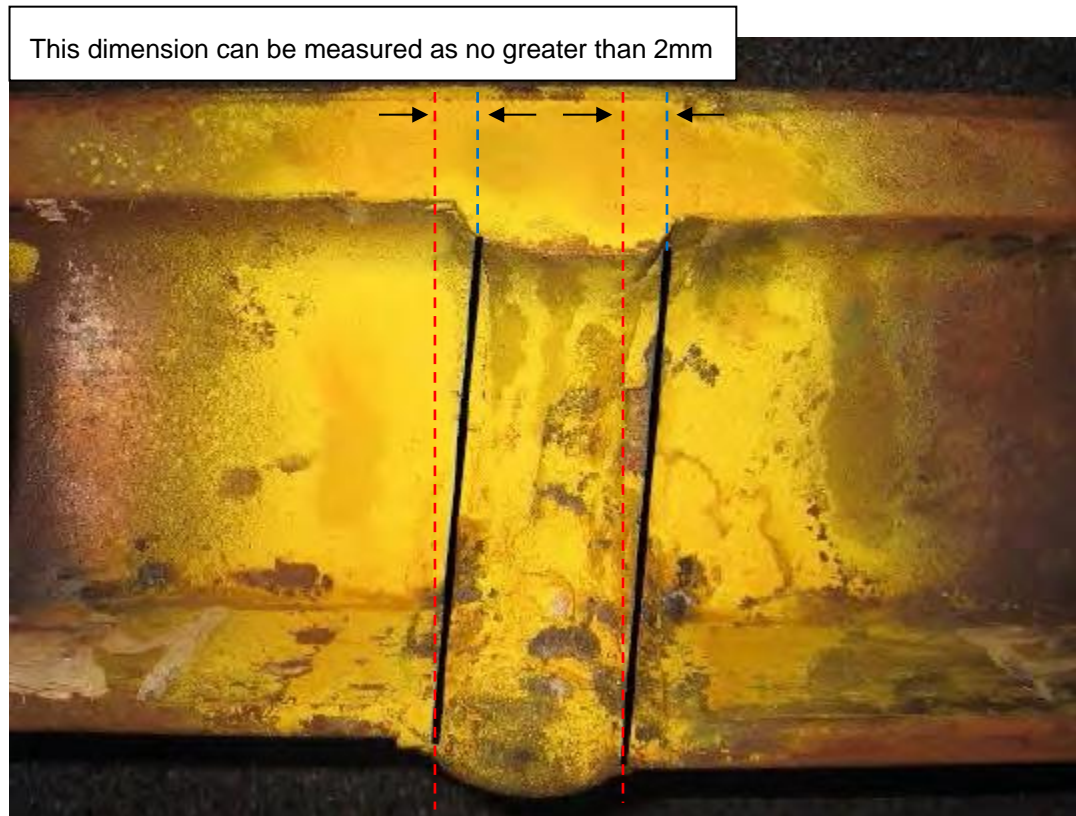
Rail Weld Defect (Weld Collar Vertical Misalignment)
